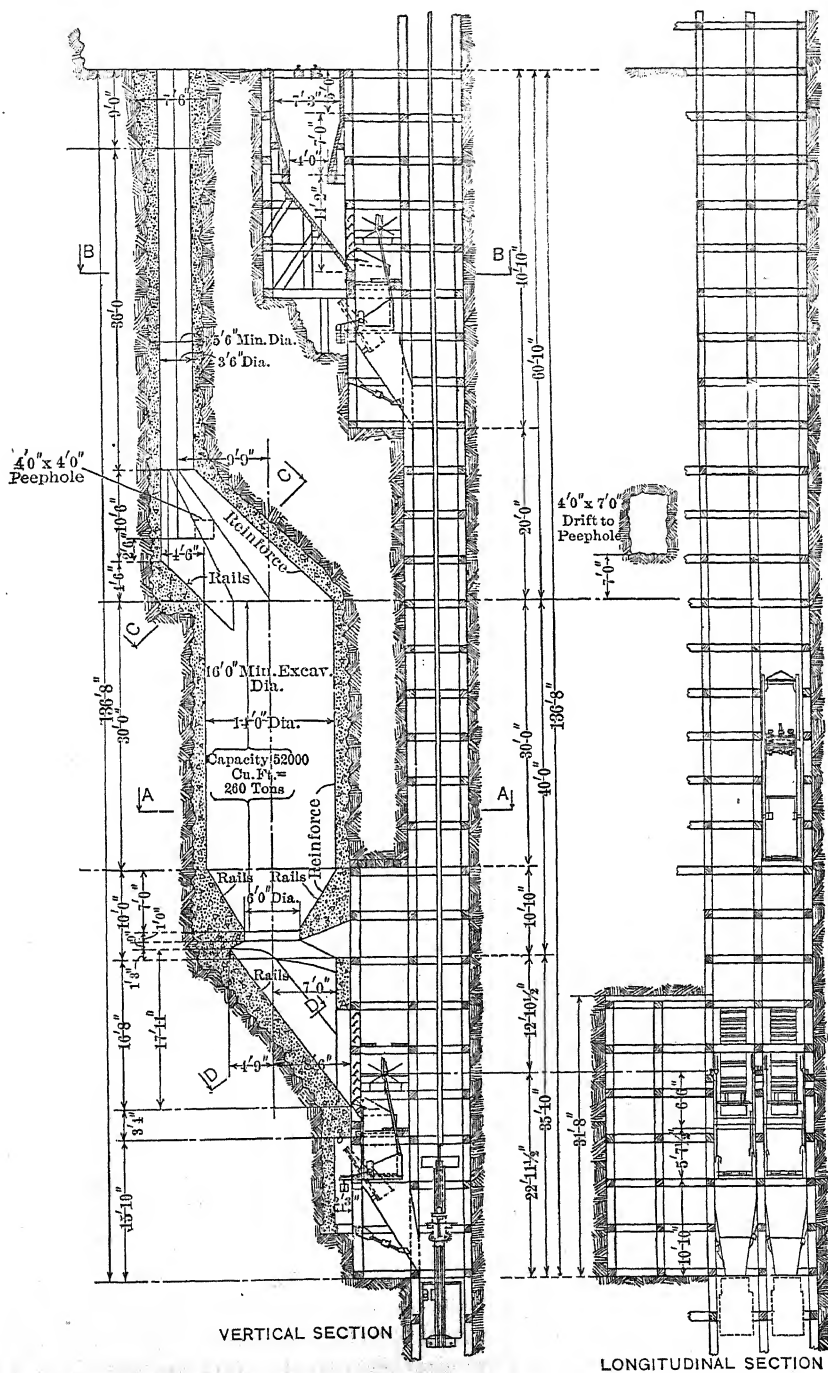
PLAN, ELEVATION, AND SECTIONS OF 260-TON CONCRETE ORE POCKET.
